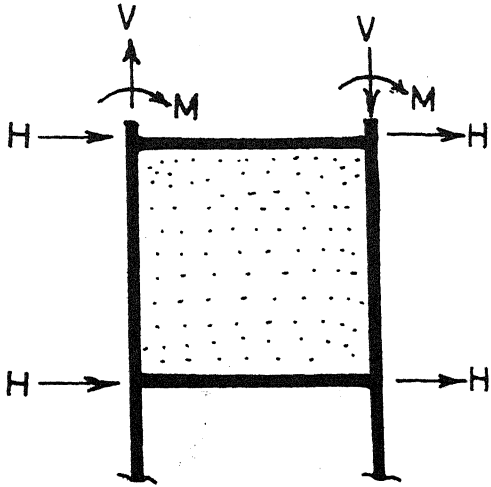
Infilled frame - storey segment of a multistorey building under combined loading
